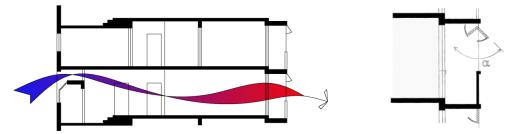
Sections showing airflow by high-level ventilation above the corridor– (Right) moveable shading system on southern facade¹
